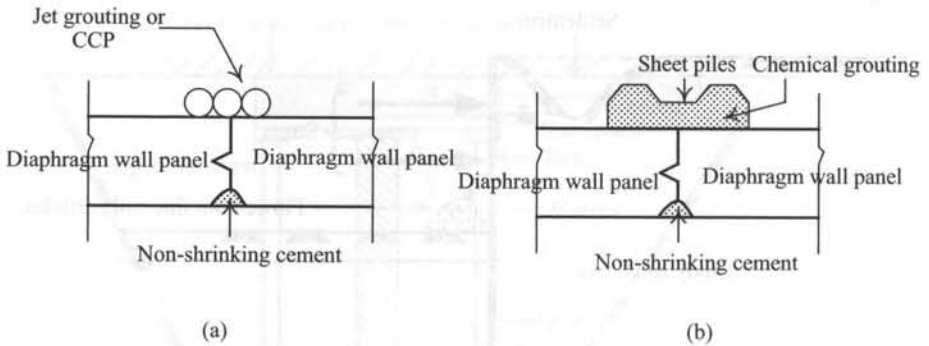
Soil improvement around joints of diaphragm wall panels and places where leakage is possible: (a) jet grouting or CCP and (b) chemical grouting.
